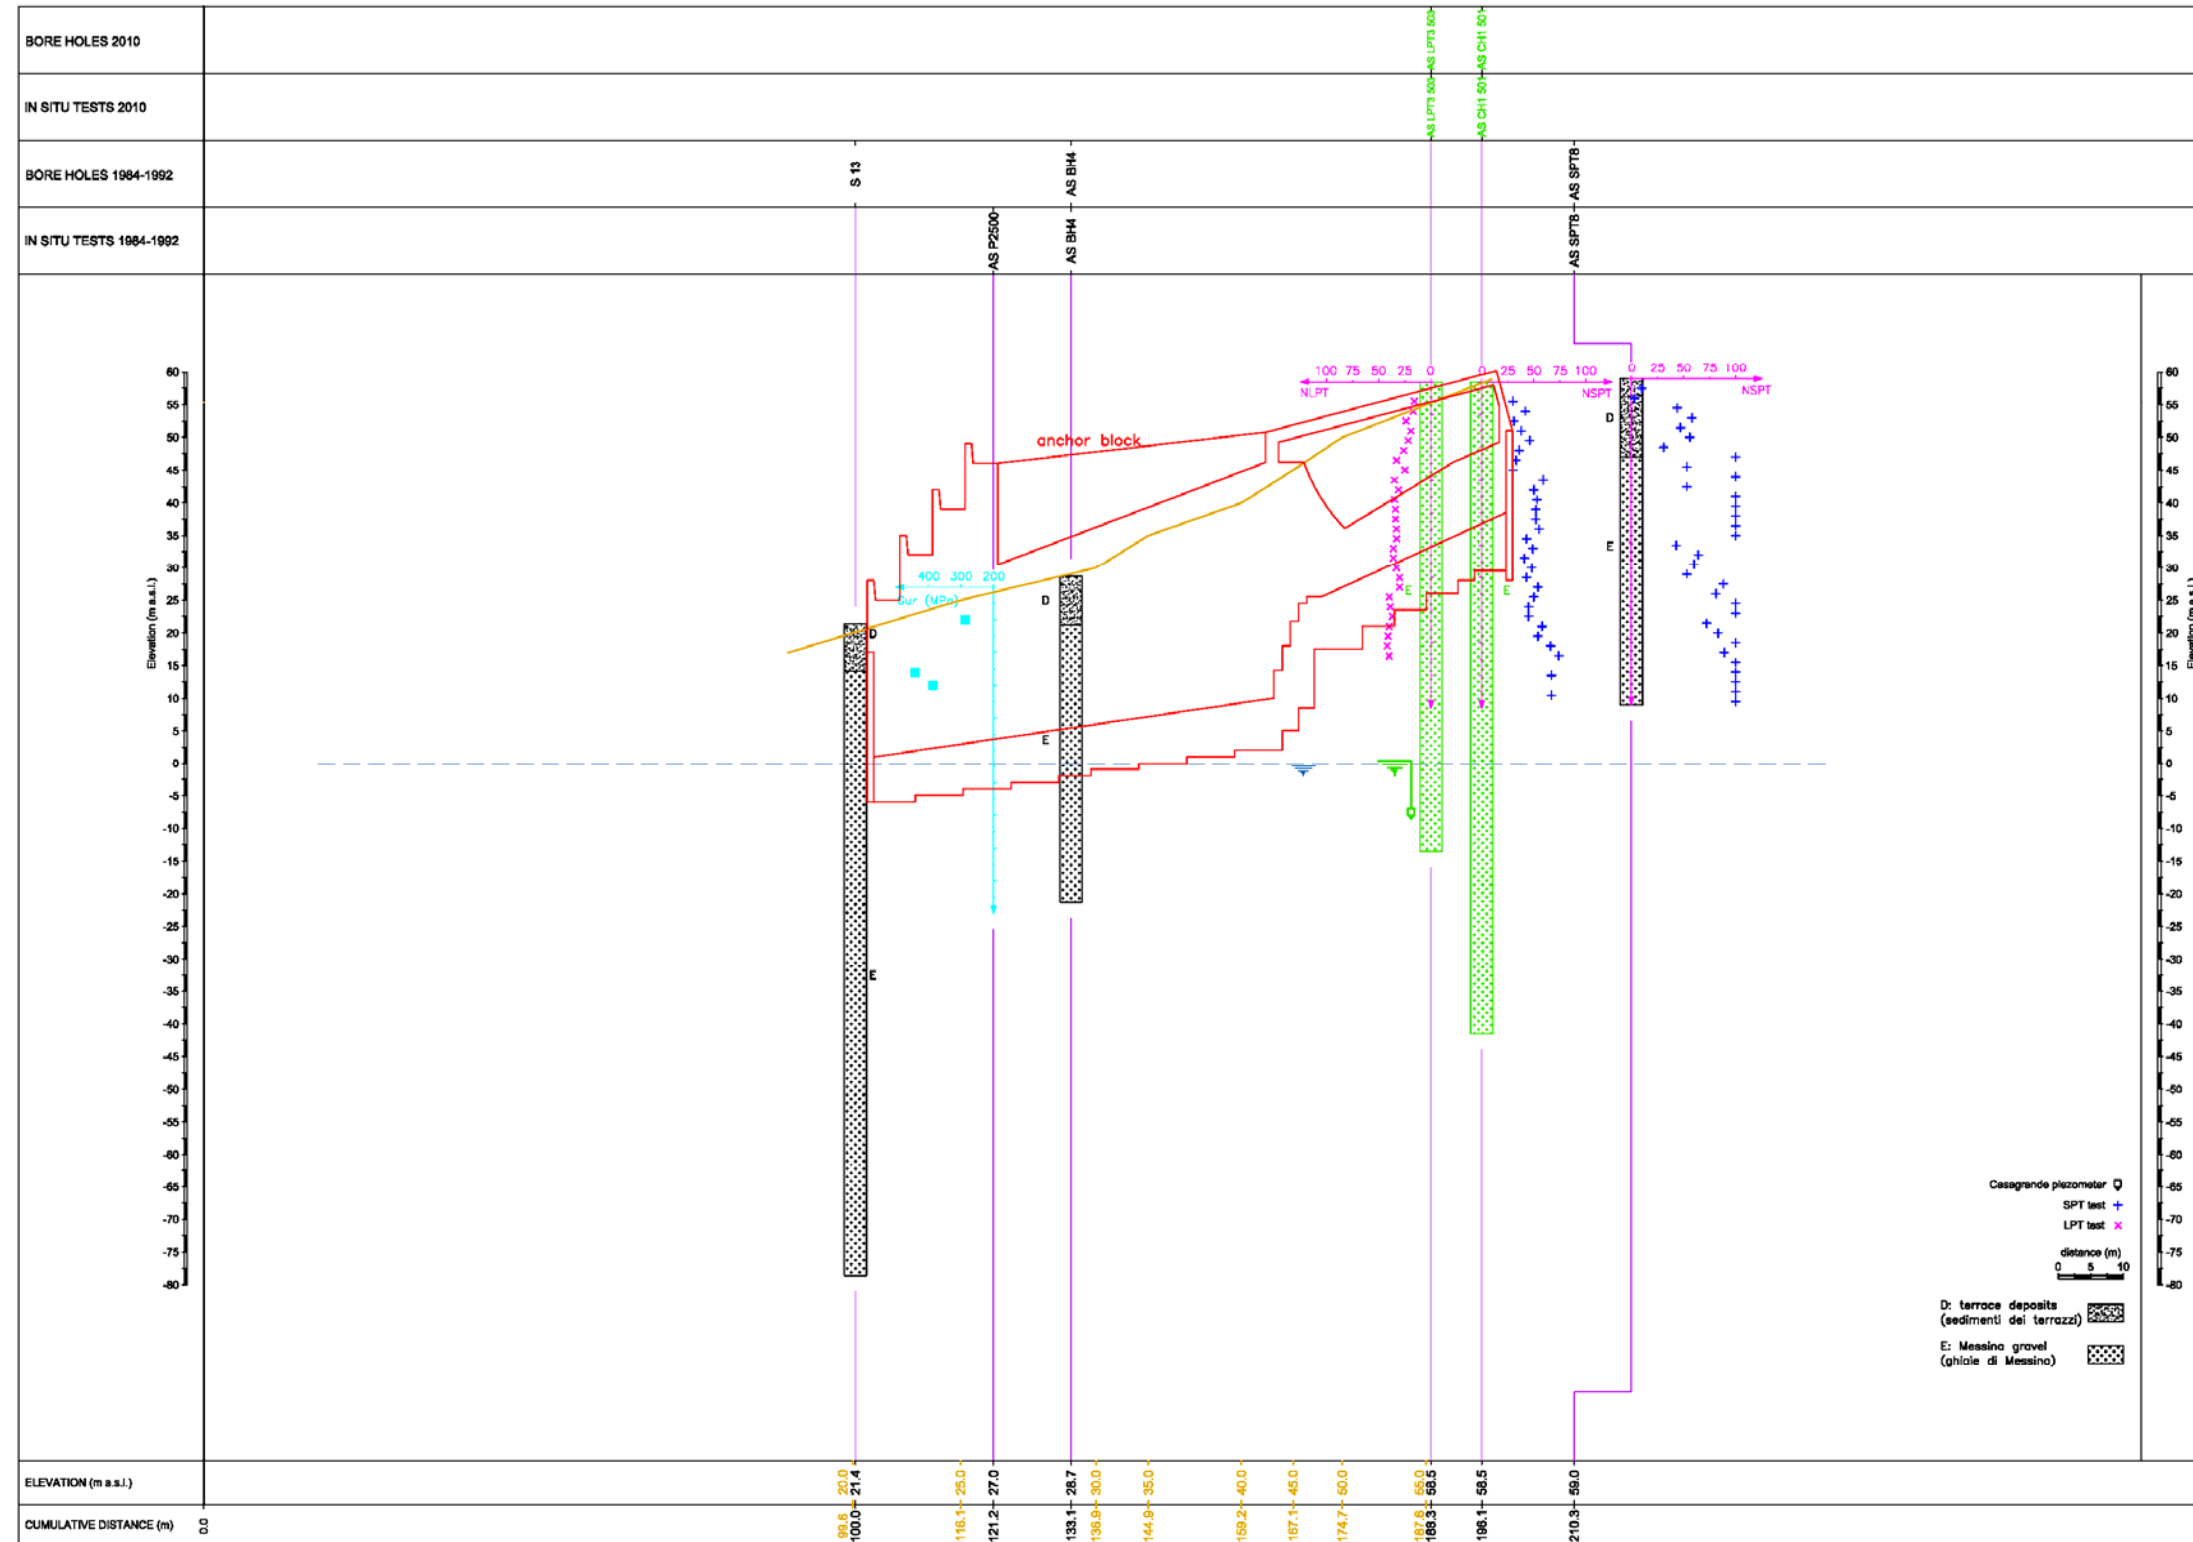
Sicily Anchor Block, longitudinal section (Section No. 4)
